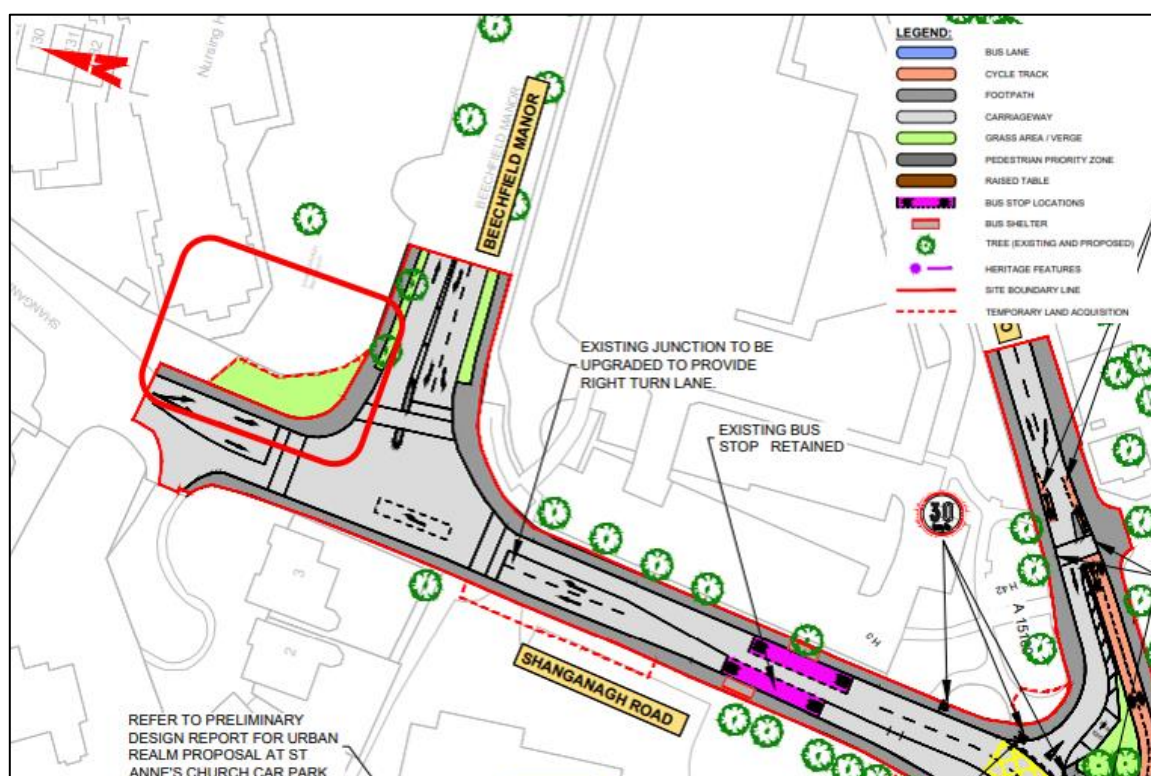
Extract from General Arrangement Drawing at Shanganagh Road (Sheet 43)
